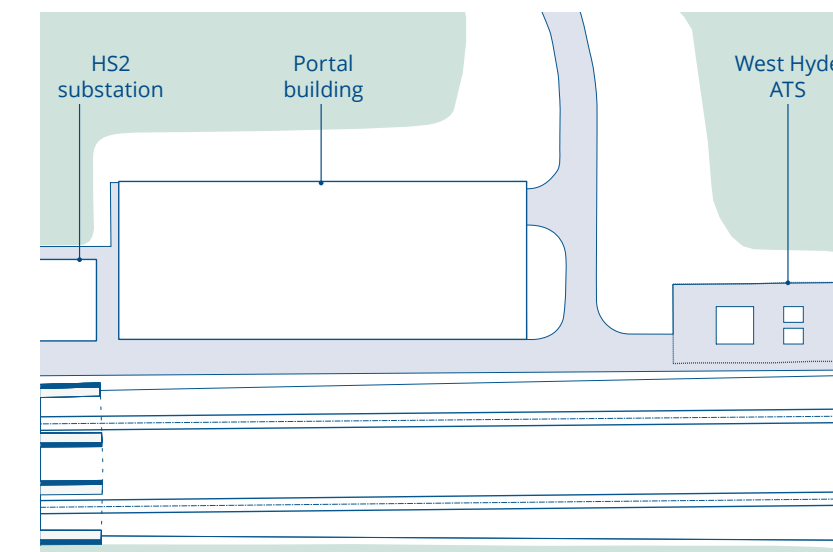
\_ Site Plan - Hybrid Bill compound arrangement
